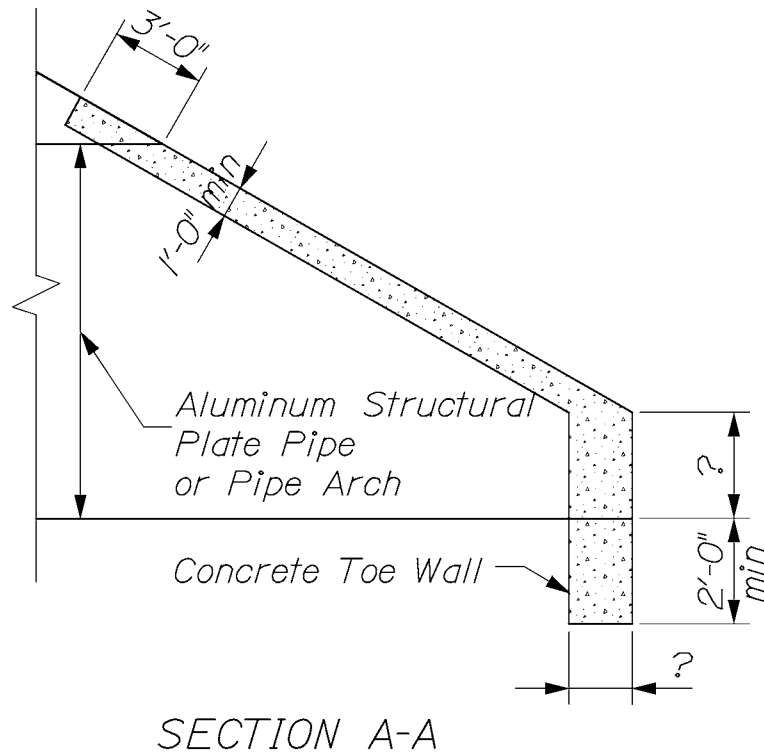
Concrete Collar for Aluminum Pipe or Pipe Arch Structures, Section Views
